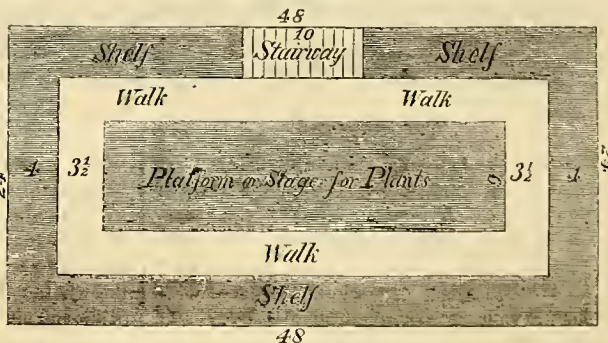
PLAN OF GREENHOUSE WITH SHELVES AND STAND.
